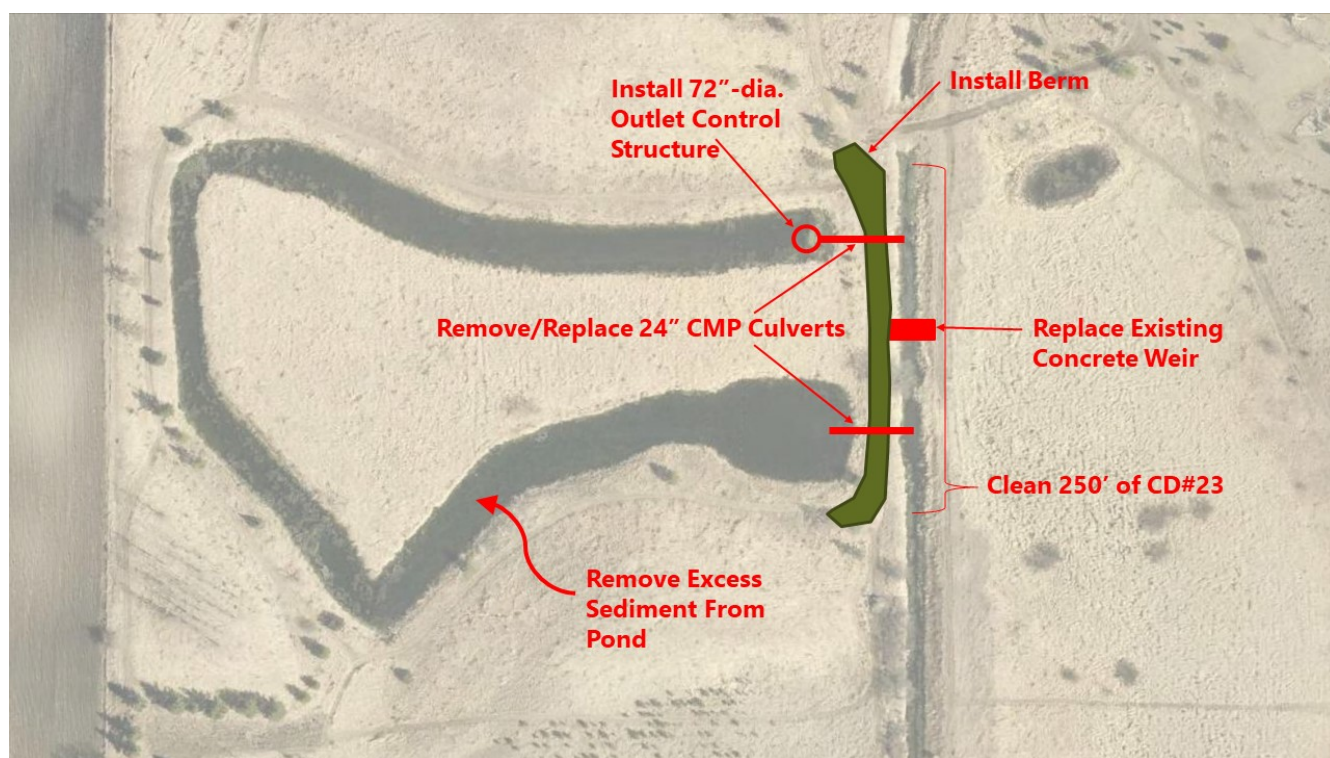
Proposed Conceptual Design for Alternative A—Retrofit Stormwater Treatment Pond
